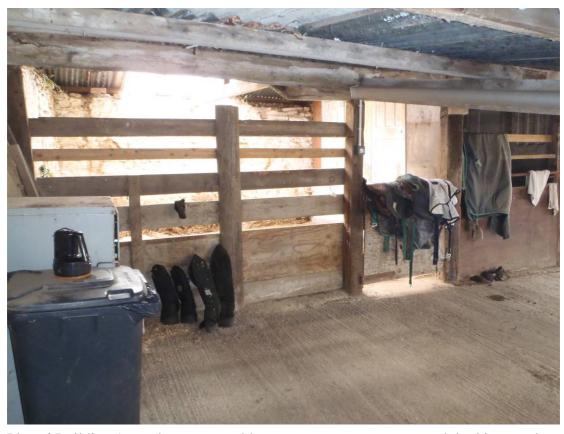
Building 1, southern part, stable compartments at eastern end, looking south
